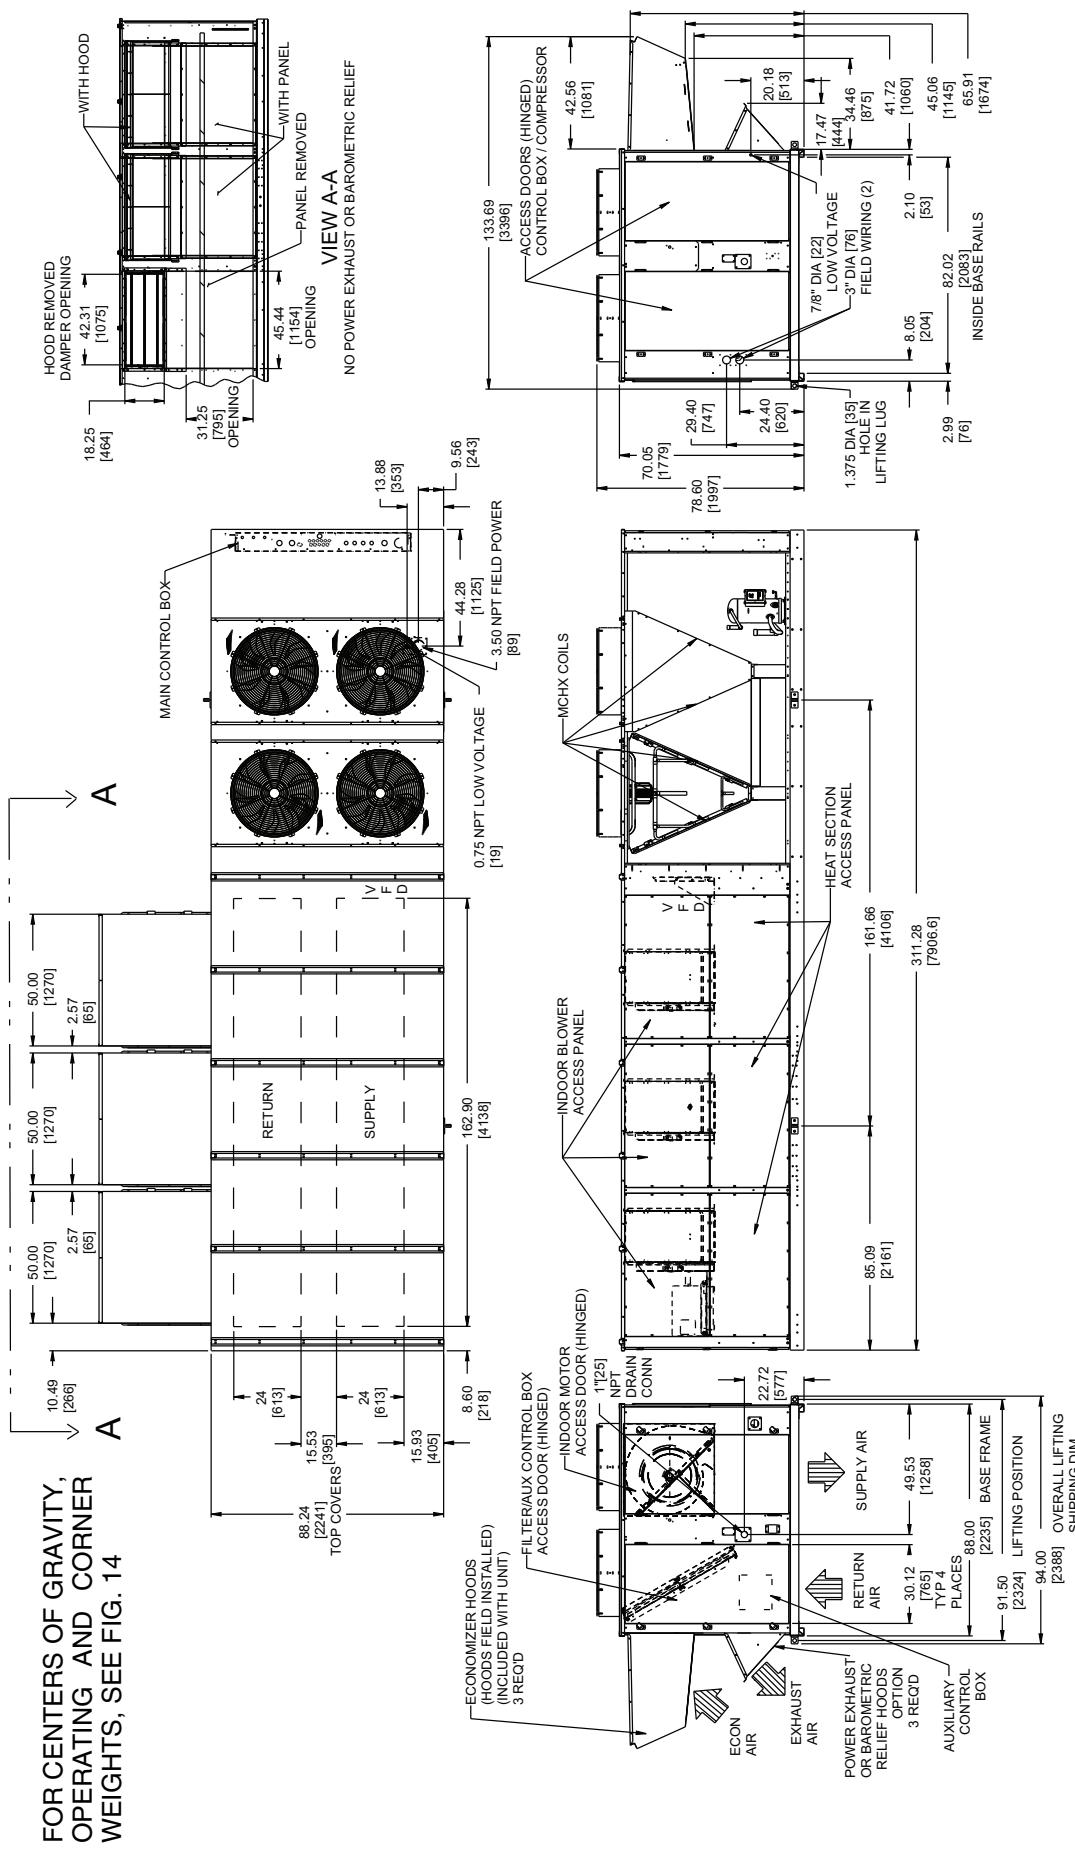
Base Unit Dimensions — 50A2,A3060 MCHX
